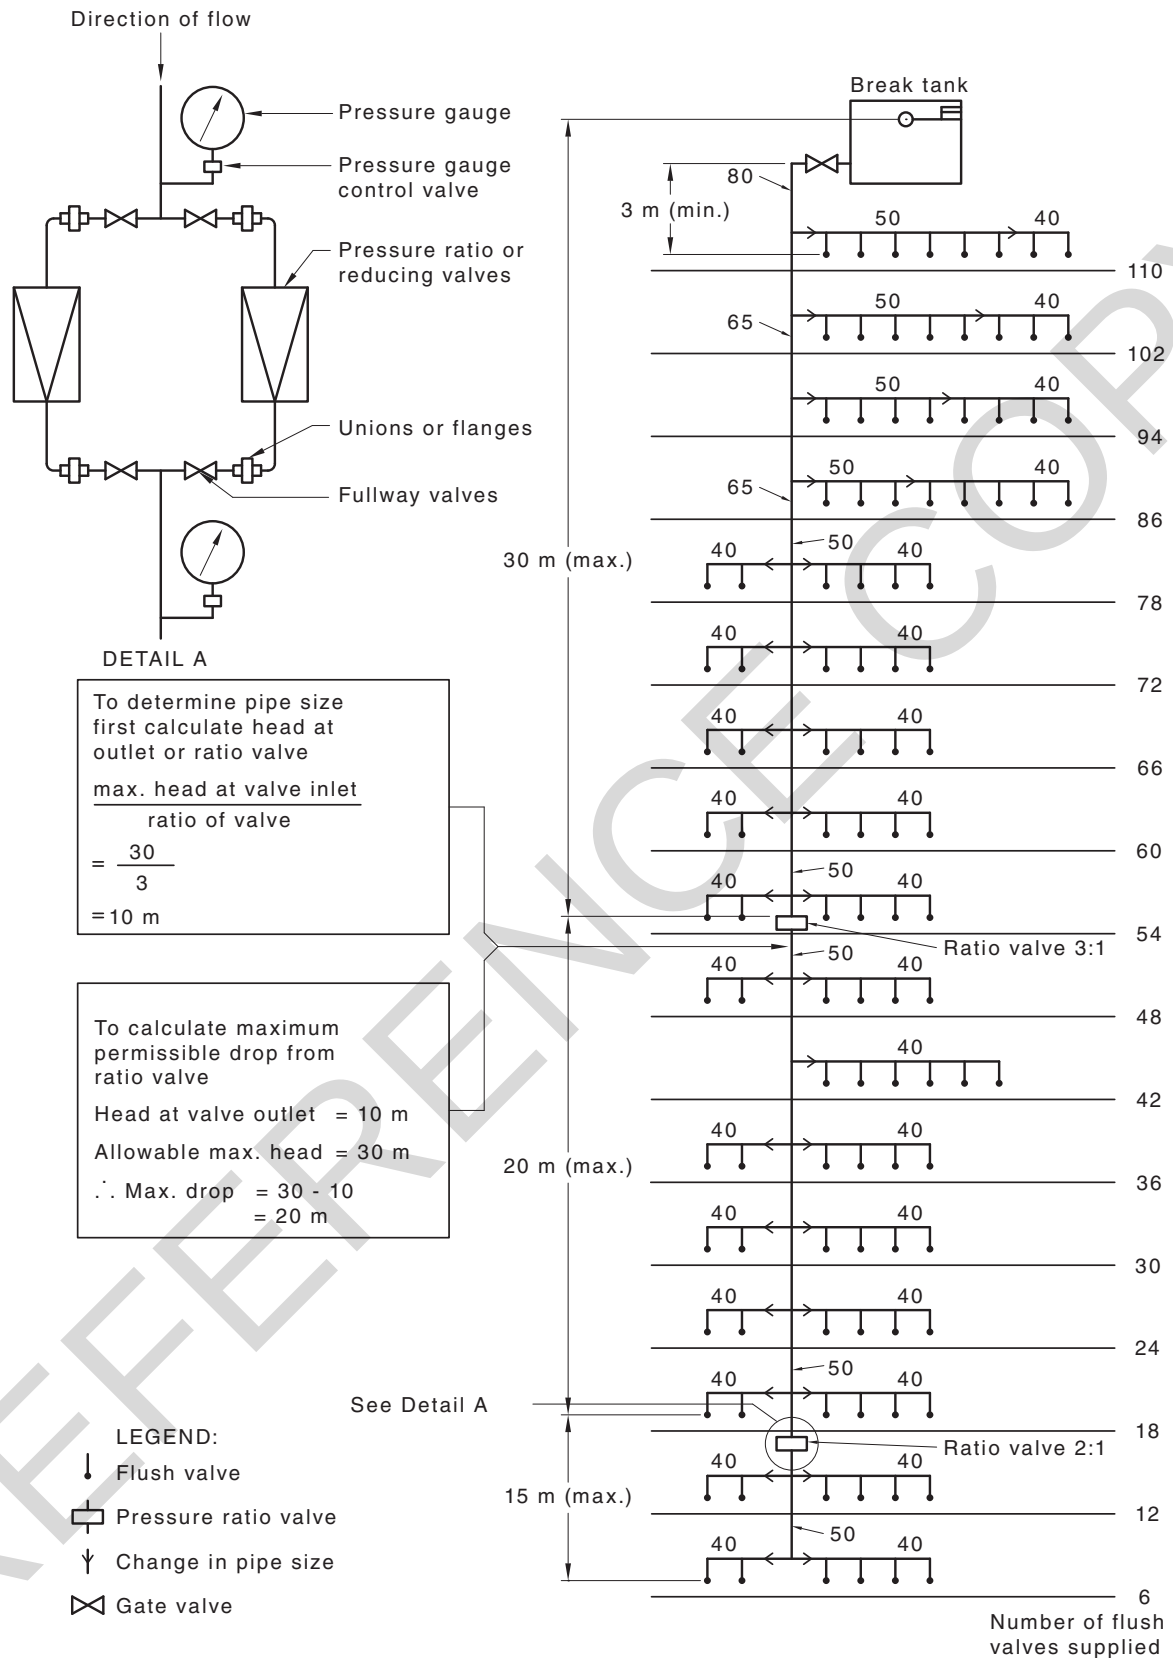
TYPICAL FLUSH VALVE INSTALLATION INCORPORATING PRESSURE RATIO VALVES
